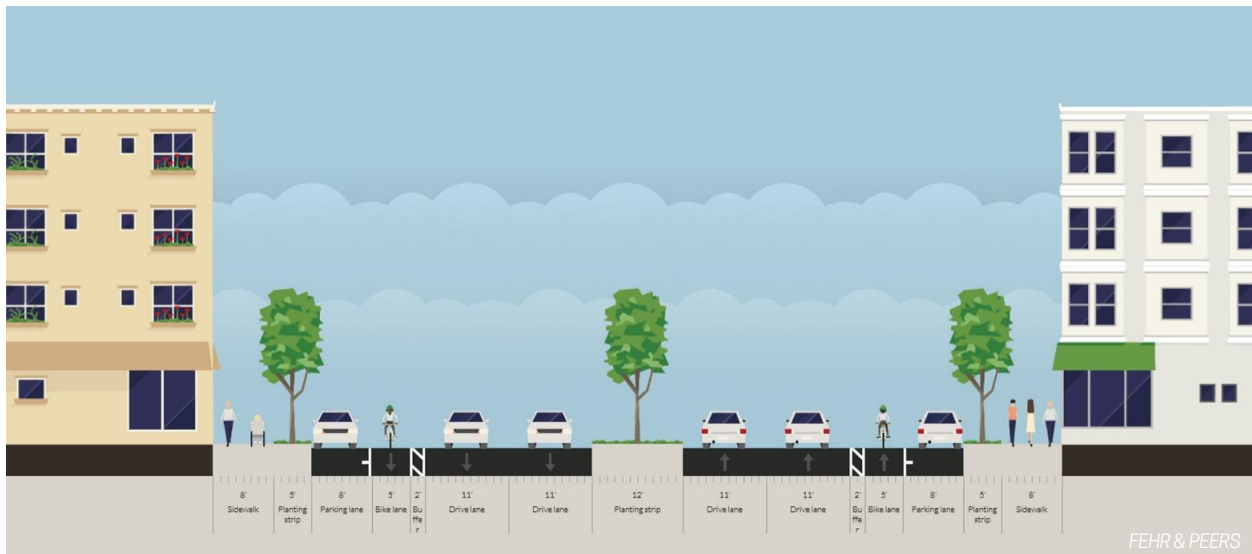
116TH AVE NE PROPOSED STREETScape PLAN
